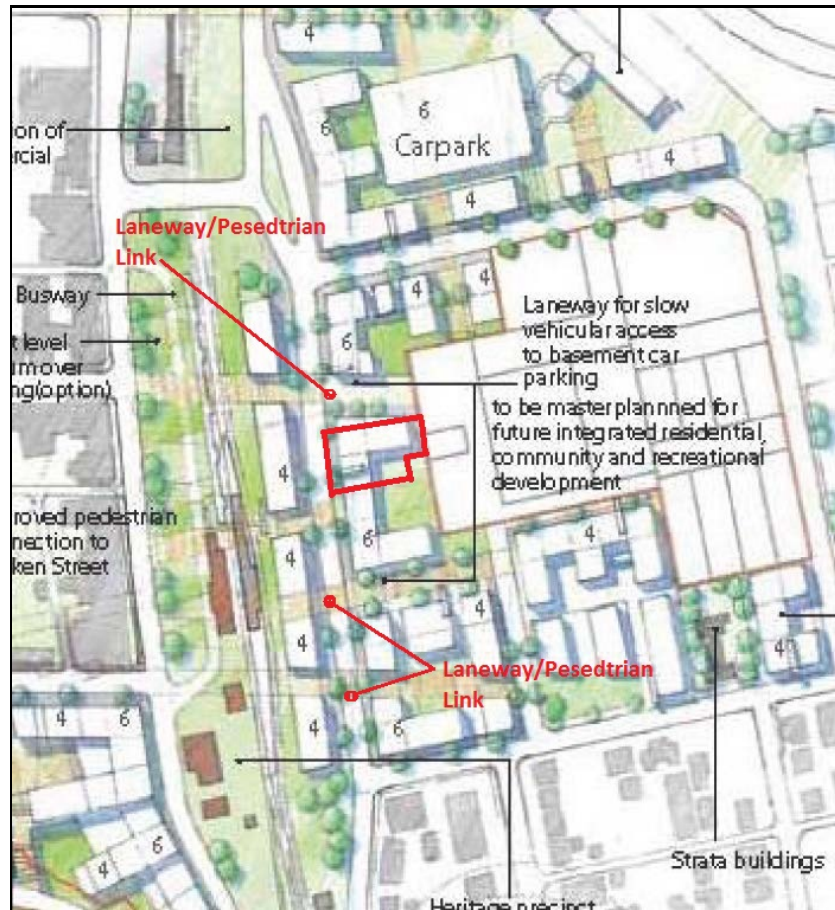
Extract from Baker Park Masterplan. Subject site shown in red
